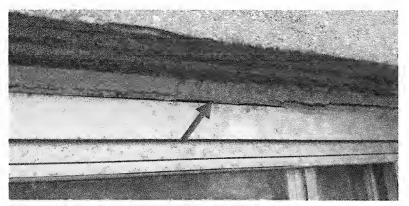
Window perimeter adhesive sealant failure at west facade
